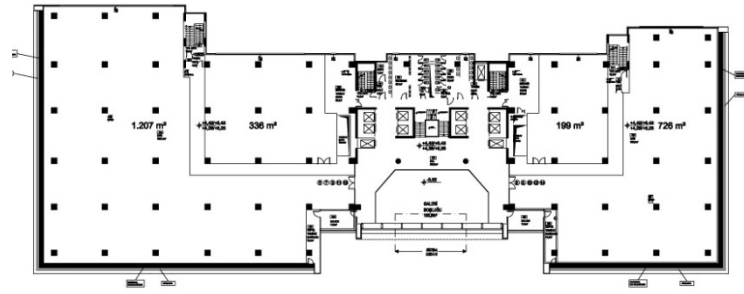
AKPLAZA, Floor plans (1st-7th floors)⁶⁴
